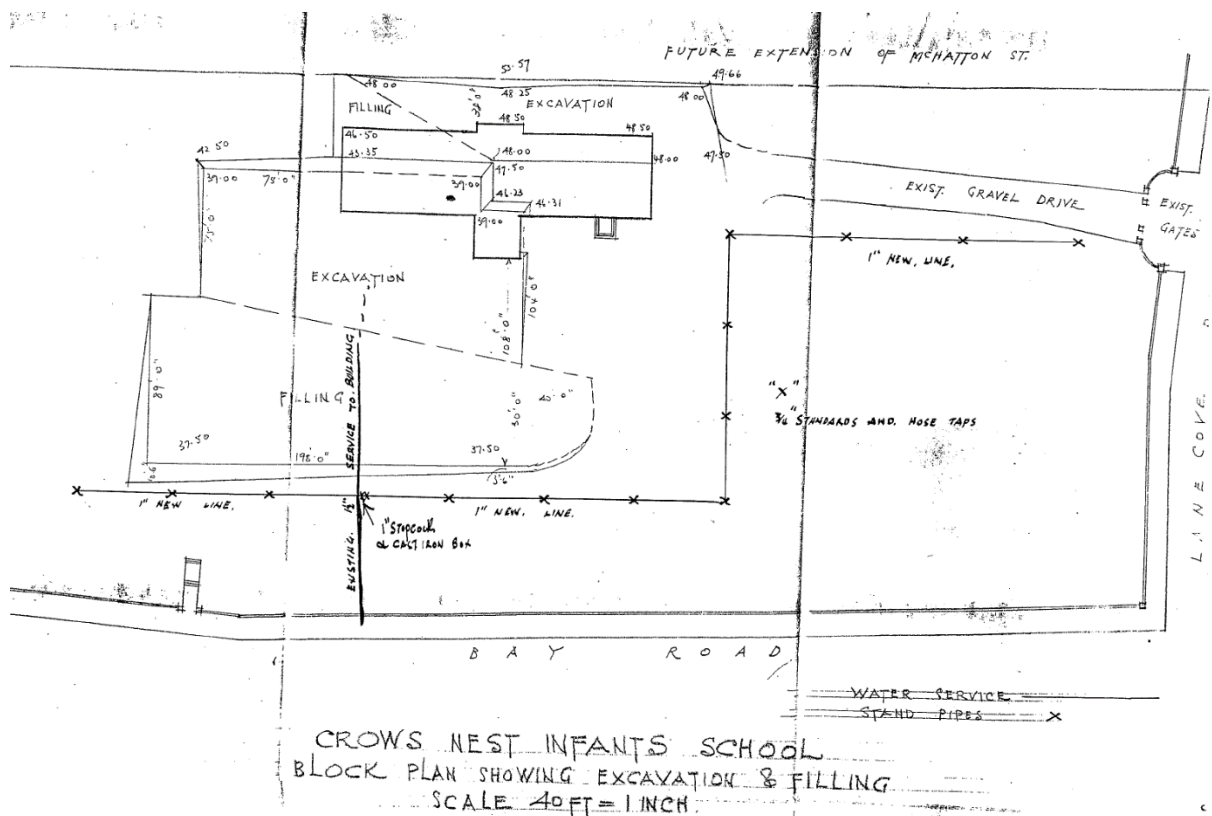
Block Plan demonstrating substantial levels of excavation and fill undertaken at the NSPS site during construction of the McHatton Building c.1930 (Source: NSPS Archives)
